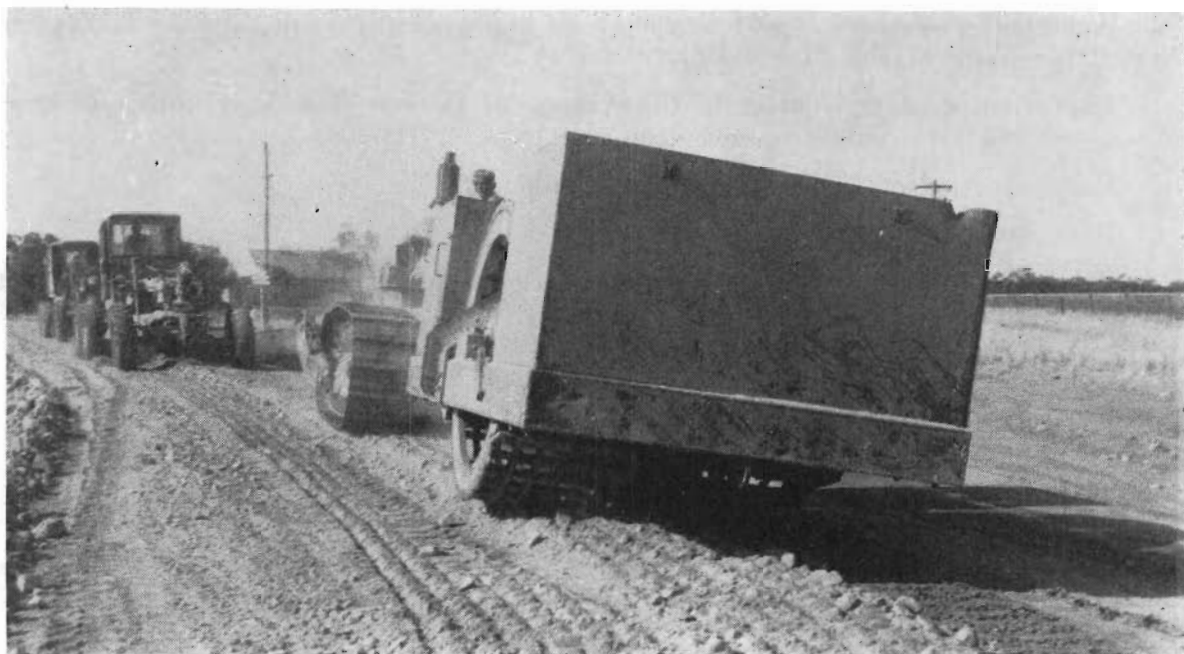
Calder Highway—Grid Roller working on new alignment at Dumosa.
